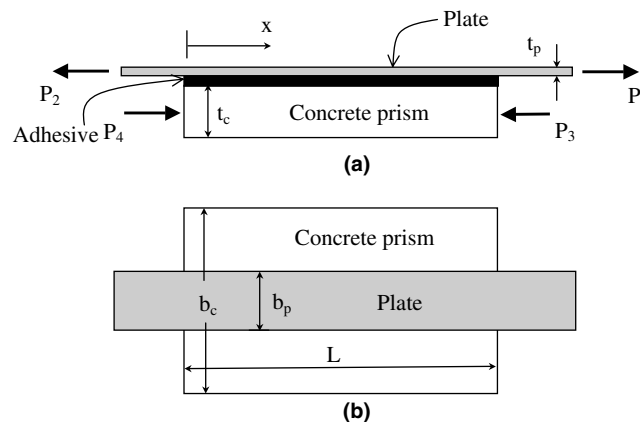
Idealized model of FRP-to-concrete bonded joint between two adjacent cracks. (a) Elevation; (b) plan.
